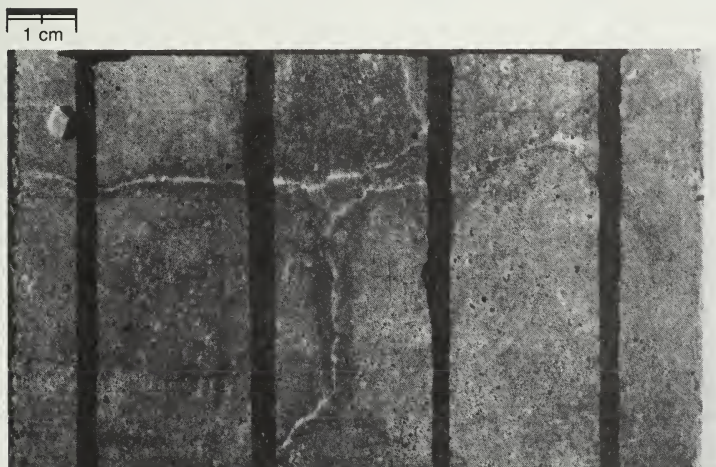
Intersecting deterioration cracks on the surface of a chert (group 1) test beam. The black lines mark where the beam will be cut into slabs.
